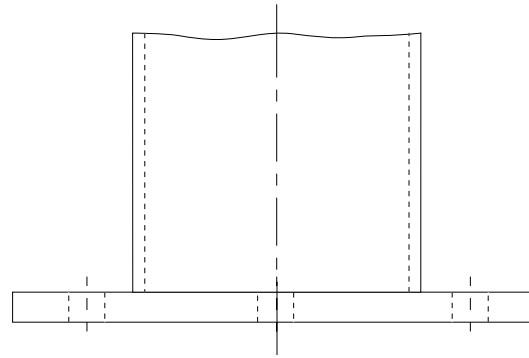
/2" x 3-1/2" x 3/16" BASEPLATE ASSEMBLY SIDE ELEVATION
